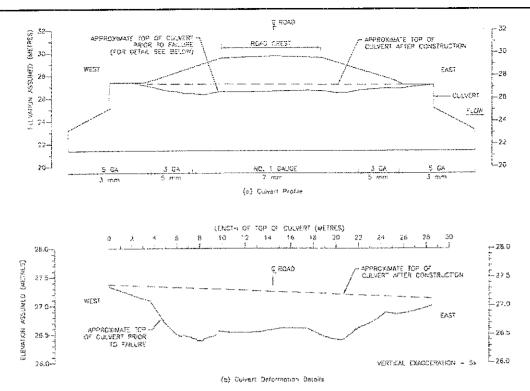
Big Mountain Creek culvert -Deformation of top of culvert prior to failure.
